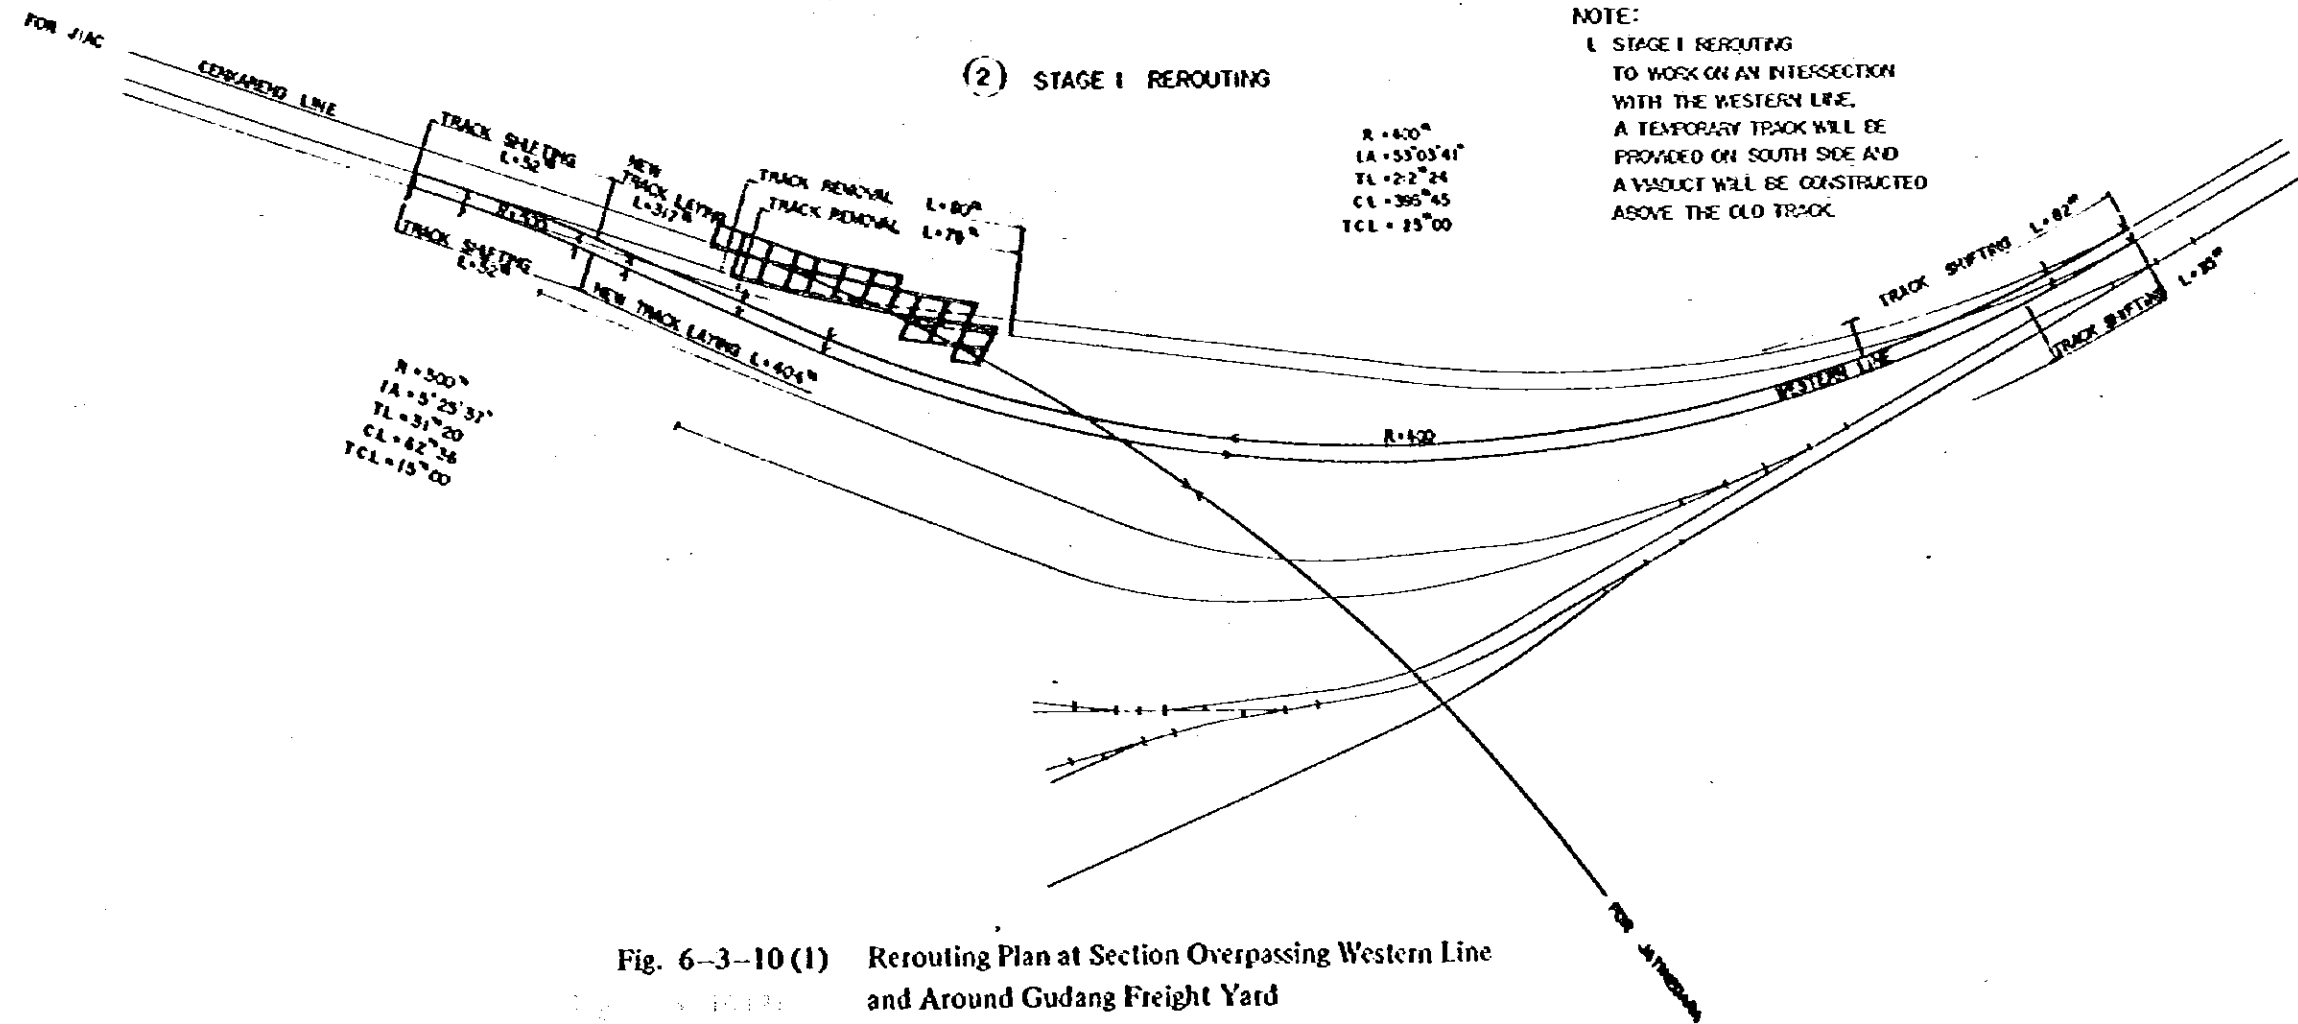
(1) Rerouting Plan at Section Overpassing Western Line and Around Gudang Freight Yard
